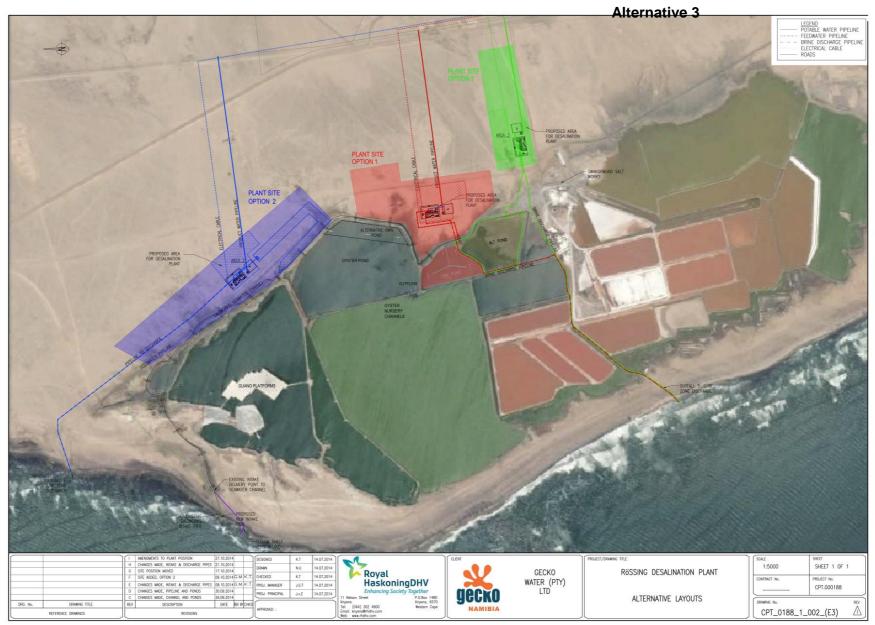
Proposed Project Development Plan (SLR/Aurecon. 2014)
